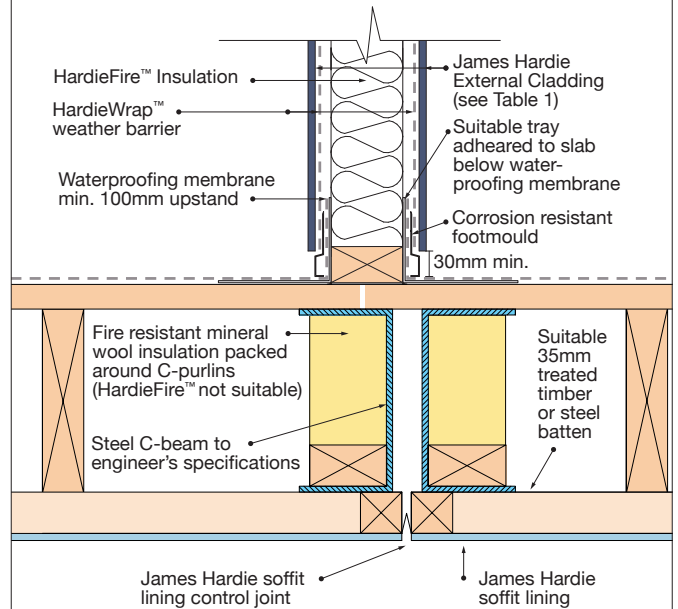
B HARDIESMART™ BLADE WALL SEPARATING CANTILEVERED BALCONY, SAME TENANCY BELOW
